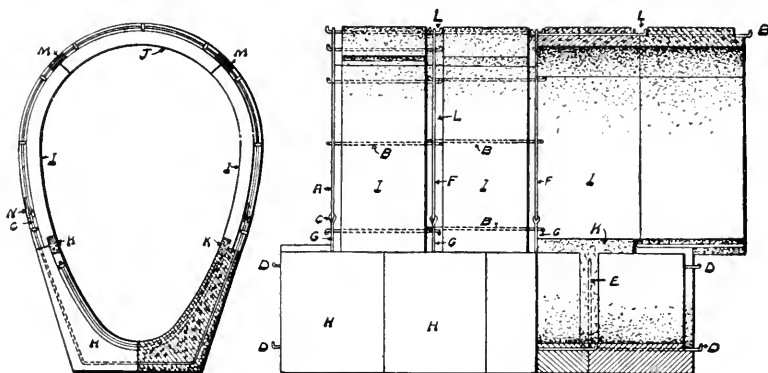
A, reinforcing rod connecting side and arch blocks to invert at C; B, lateral reinforcing rod interlocking side and arch blocks with invert reinforcing rod G; C, loop eye in rod; D, lateral reinforcement of invert connecting invert blocks and engaging rod E of invert; H, invert blocks; I, side blocks; J, arch blocks; K and M, grout of cement mortar sealing reinforcement; L, grout chambers for sealing reinforcement and making water-tight joint; N, grout in place.
